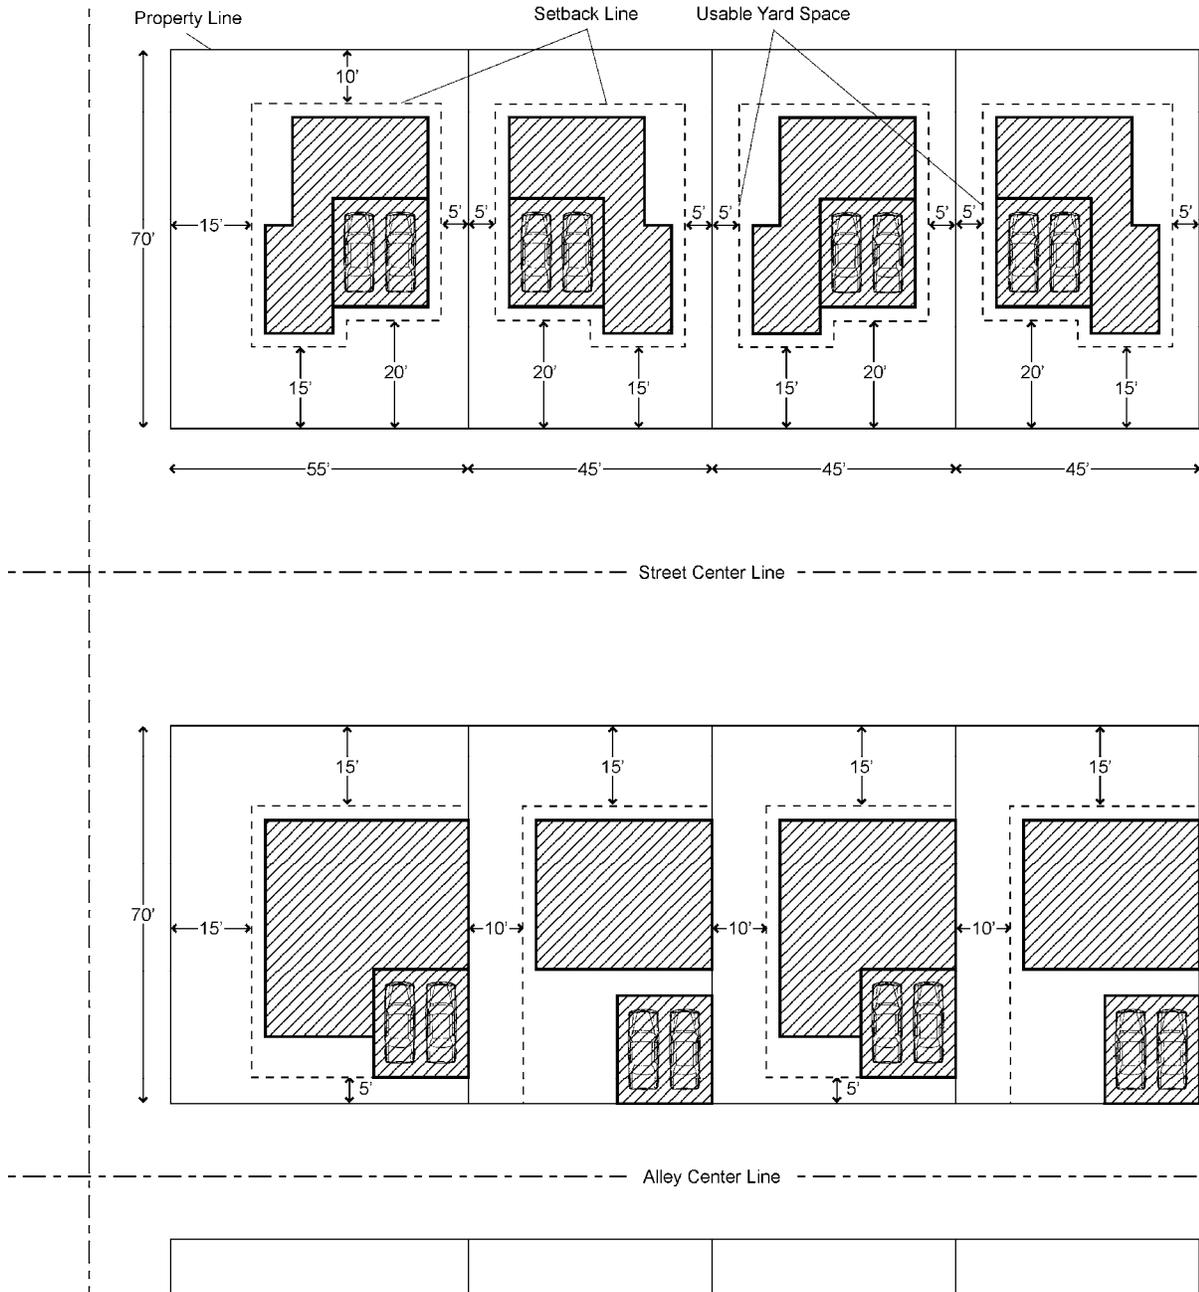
Setbacks and Garages for Individual Detached Single Family Dwelling Units
